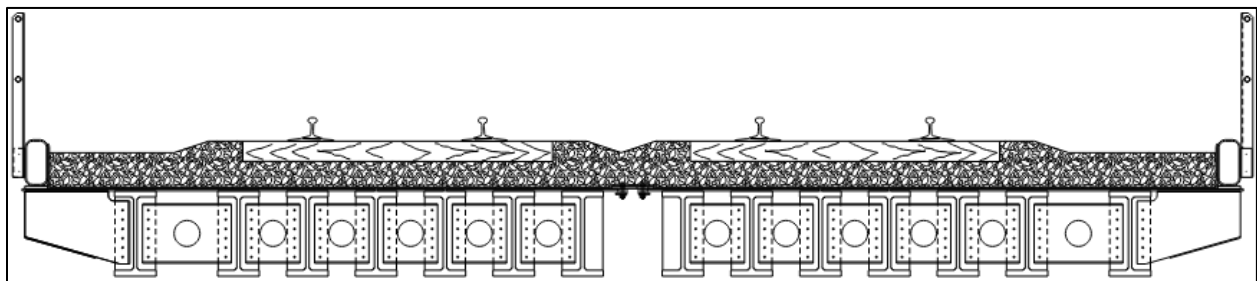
Typical Section of Ballast Deck Rolled Steel Beam Superstructure
